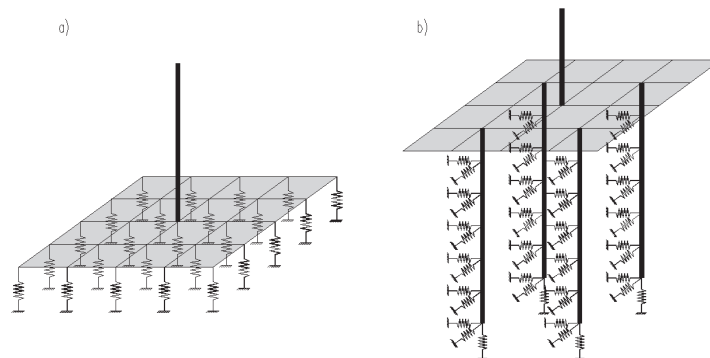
Spring supports for shallow (a) and pile (b) foundation
